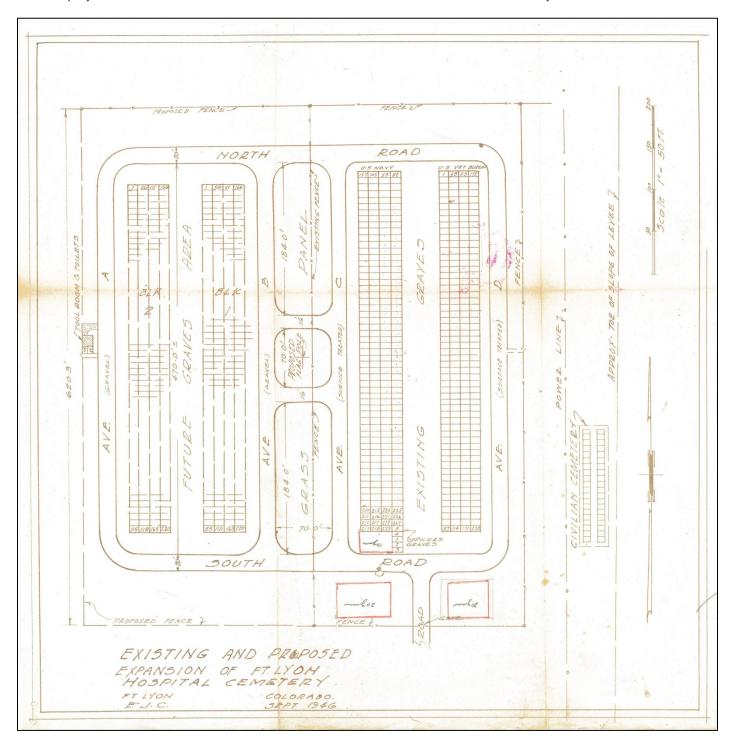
Existing and Proposed Expansion of Ft. Lyon Hospital Cemetery, 1946.
